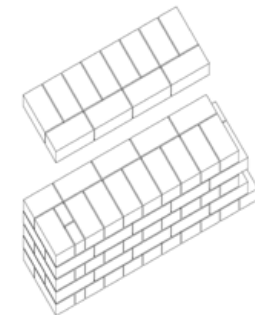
Mud wall built on the ground, Mecca and Dipasquale, 2009
